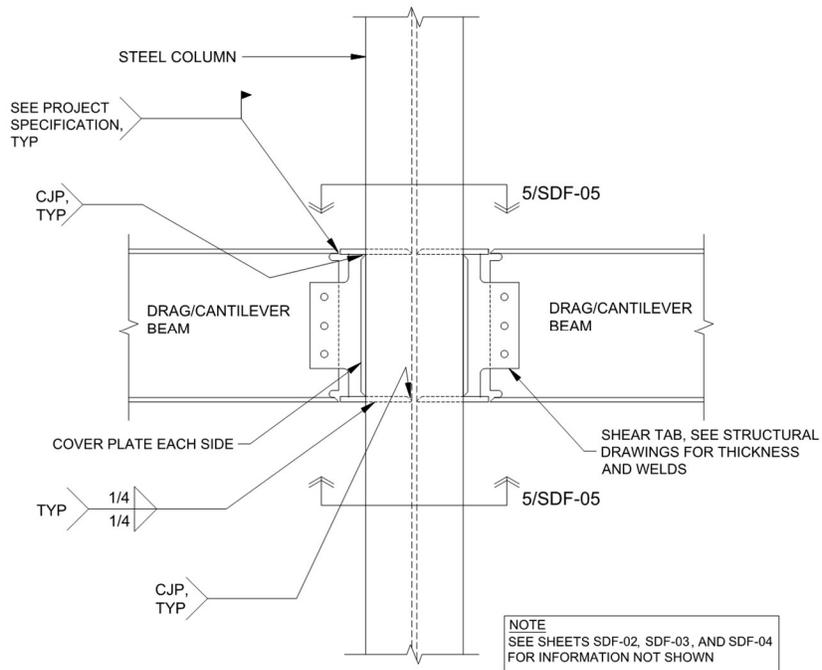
Orthogonal gravity cantilever when cantilever depth equal to DFF beam depth.
